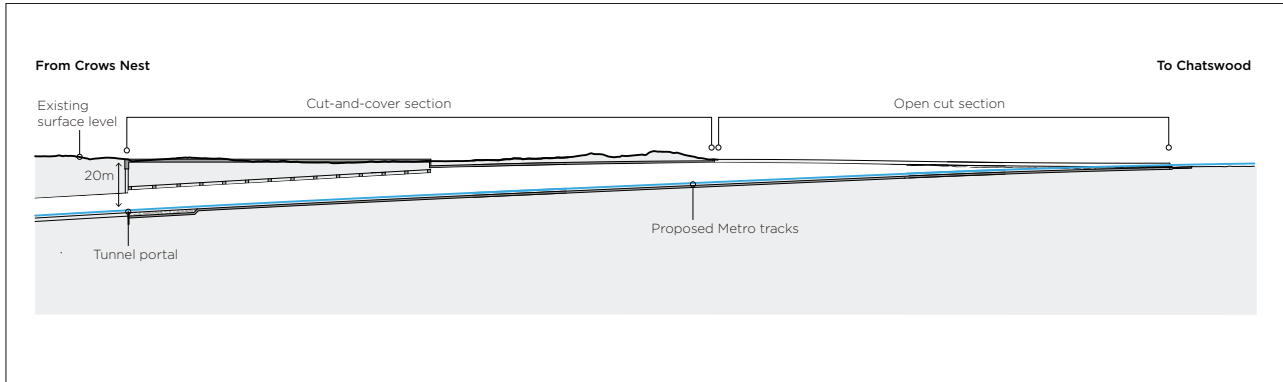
Chatswood dive structure and tunnel portal - indicative long section
